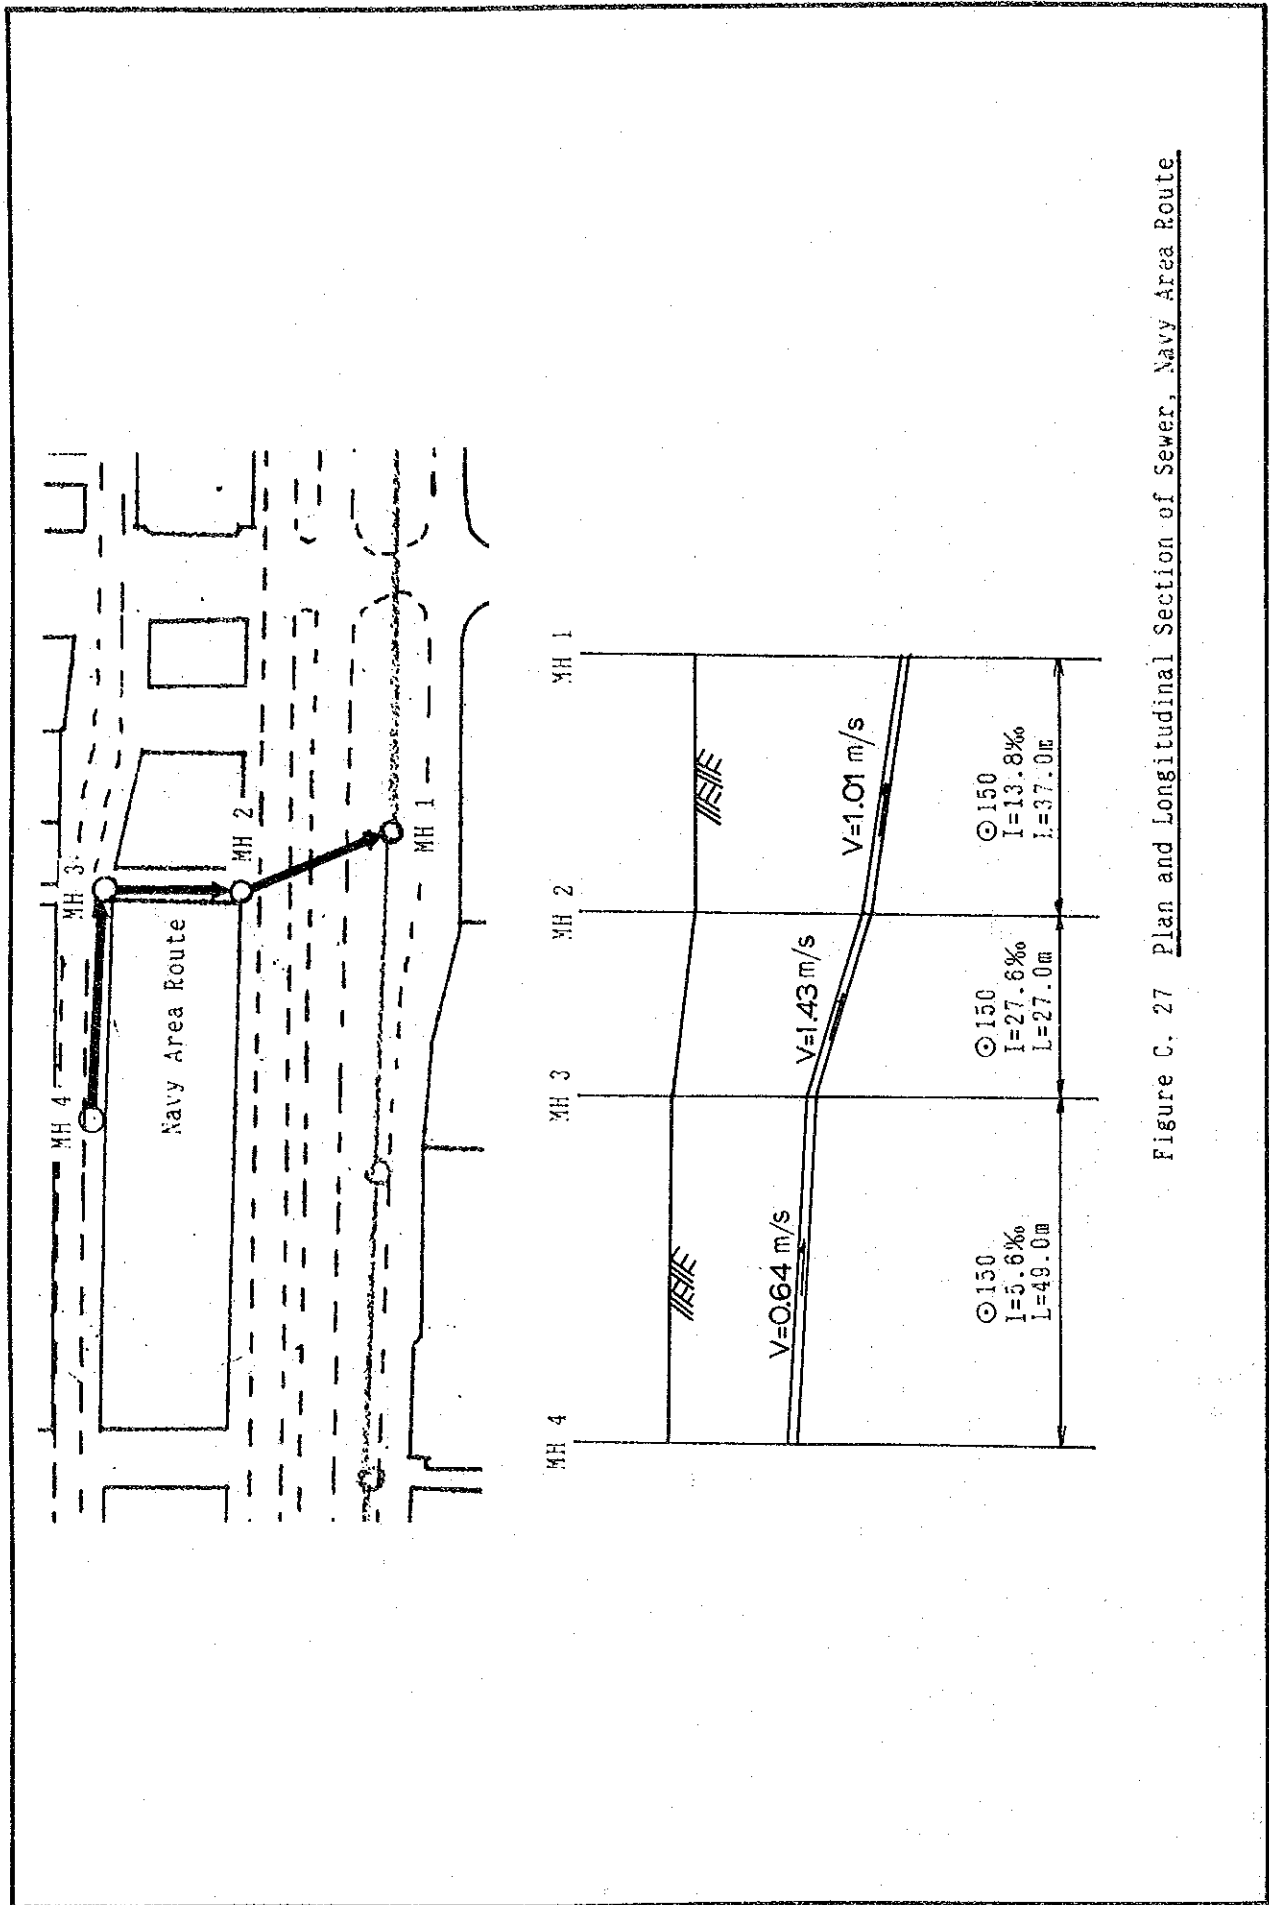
Plan and Longitudinal Section of Sewer, Navy Area Route
